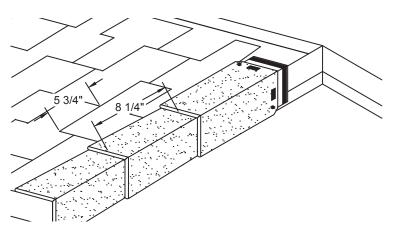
Installation of EZ-Ridge® Shingles on Rake Edges of the Roof
